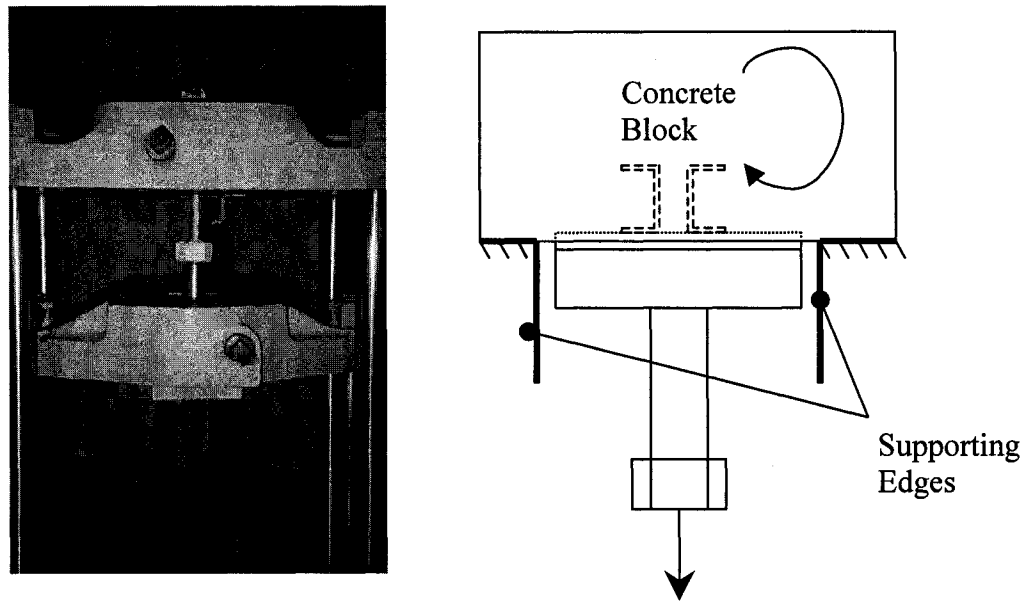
Schematic and Photograph of Specimen and Test Setup
